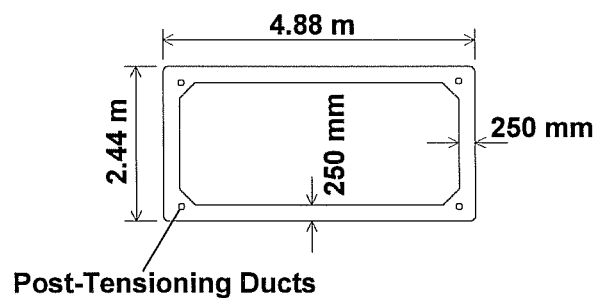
Cross-section of precast segmental piers, Dauphin Island bridge.
